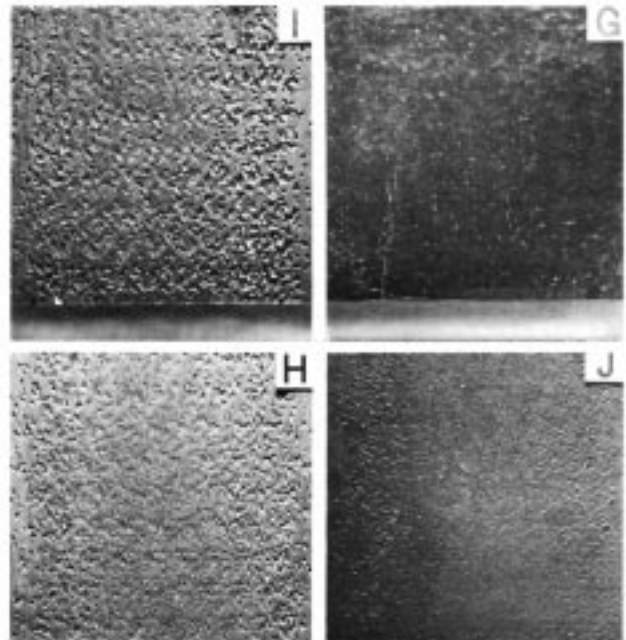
Appearance of Finish Flooring Specimens After 100 Trips with Caulk-Studded Roller
